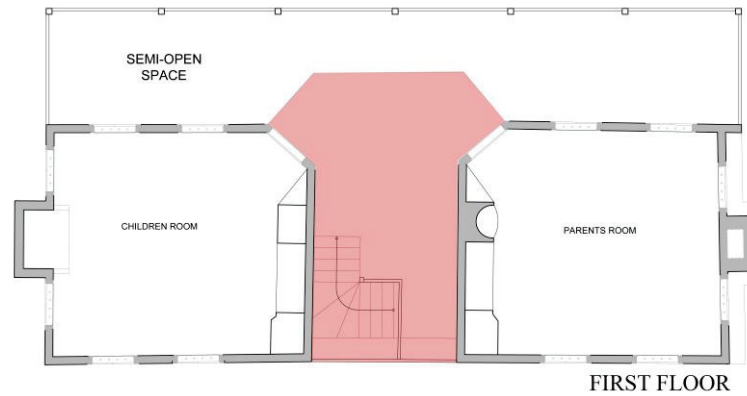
Sönmezer House first floor plan indicating glazed circulation proposal in red hatch
